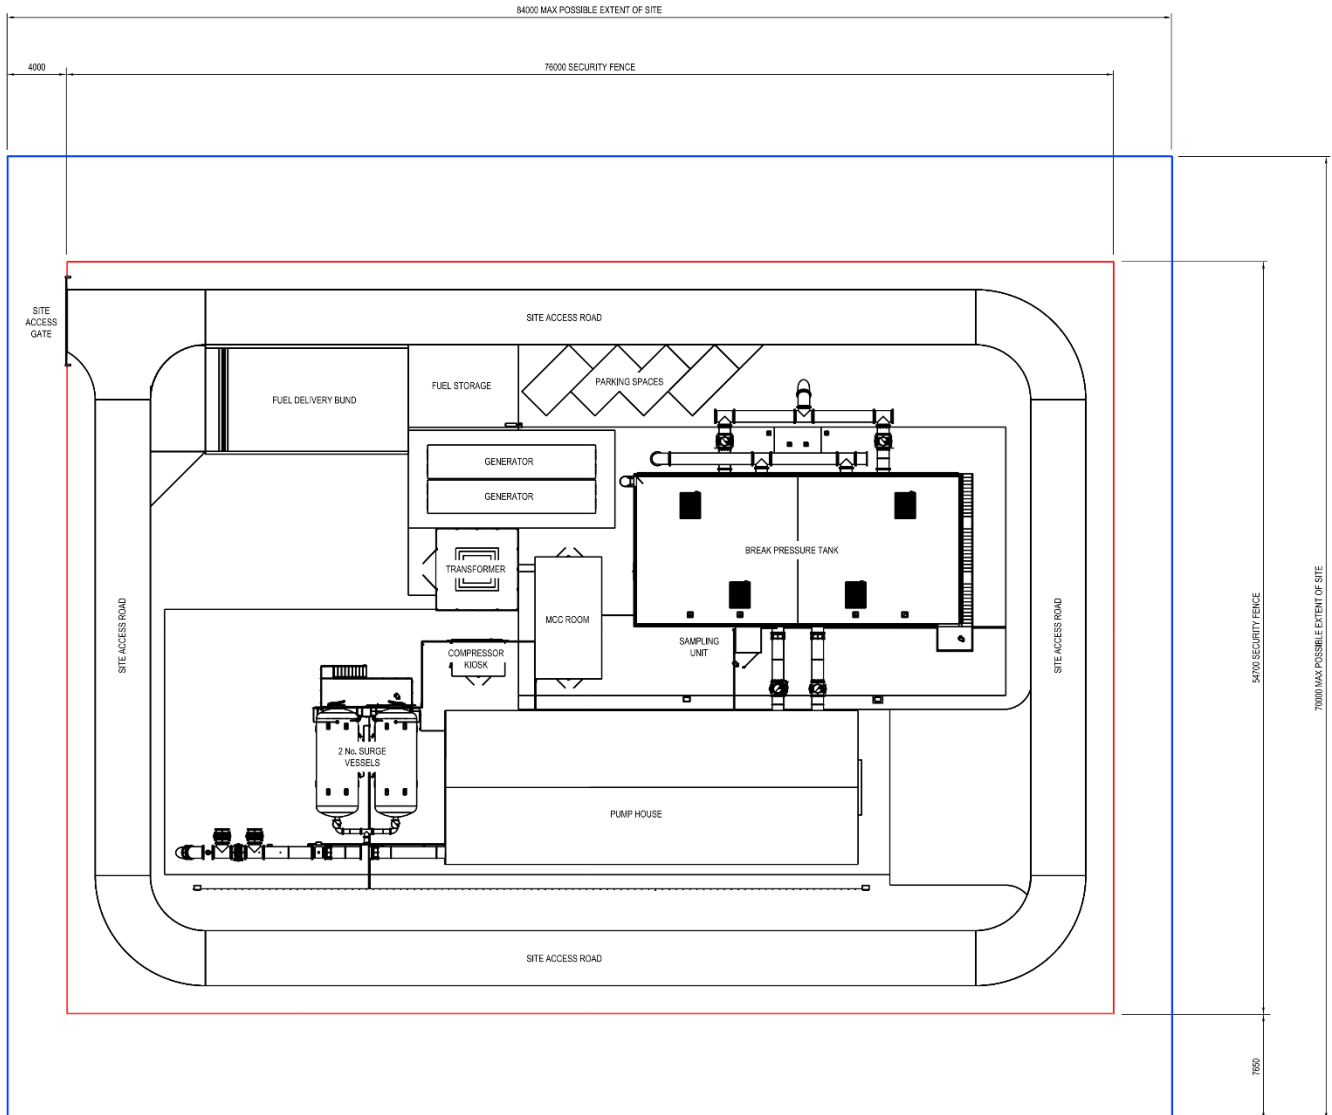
Proposed Draft Illustrative Layout of IPS with a BPT
